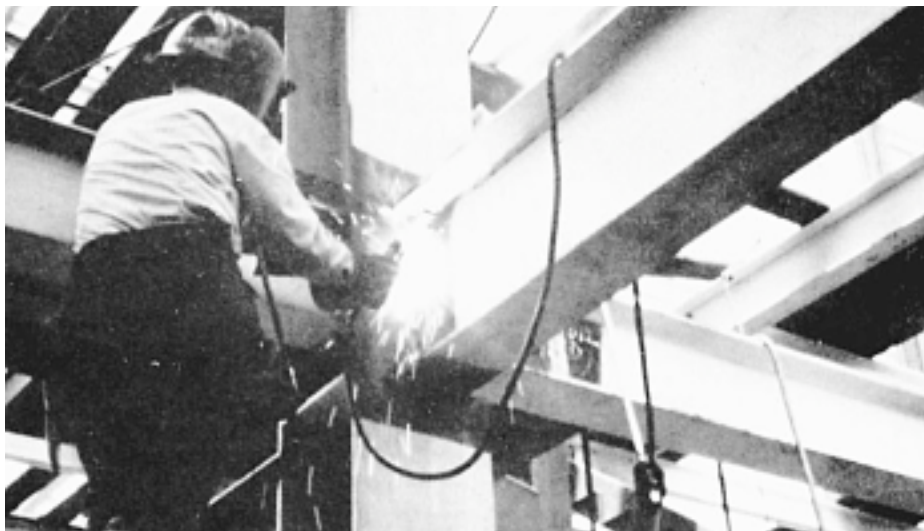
Welded steel construction. (Courtesy of American Institute of Steel Construction)
